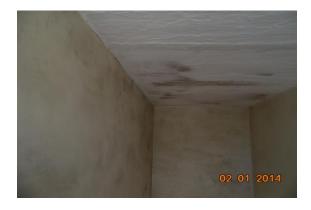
Dampness/Seepage on Wall No.2&3& roof, Second Floor
